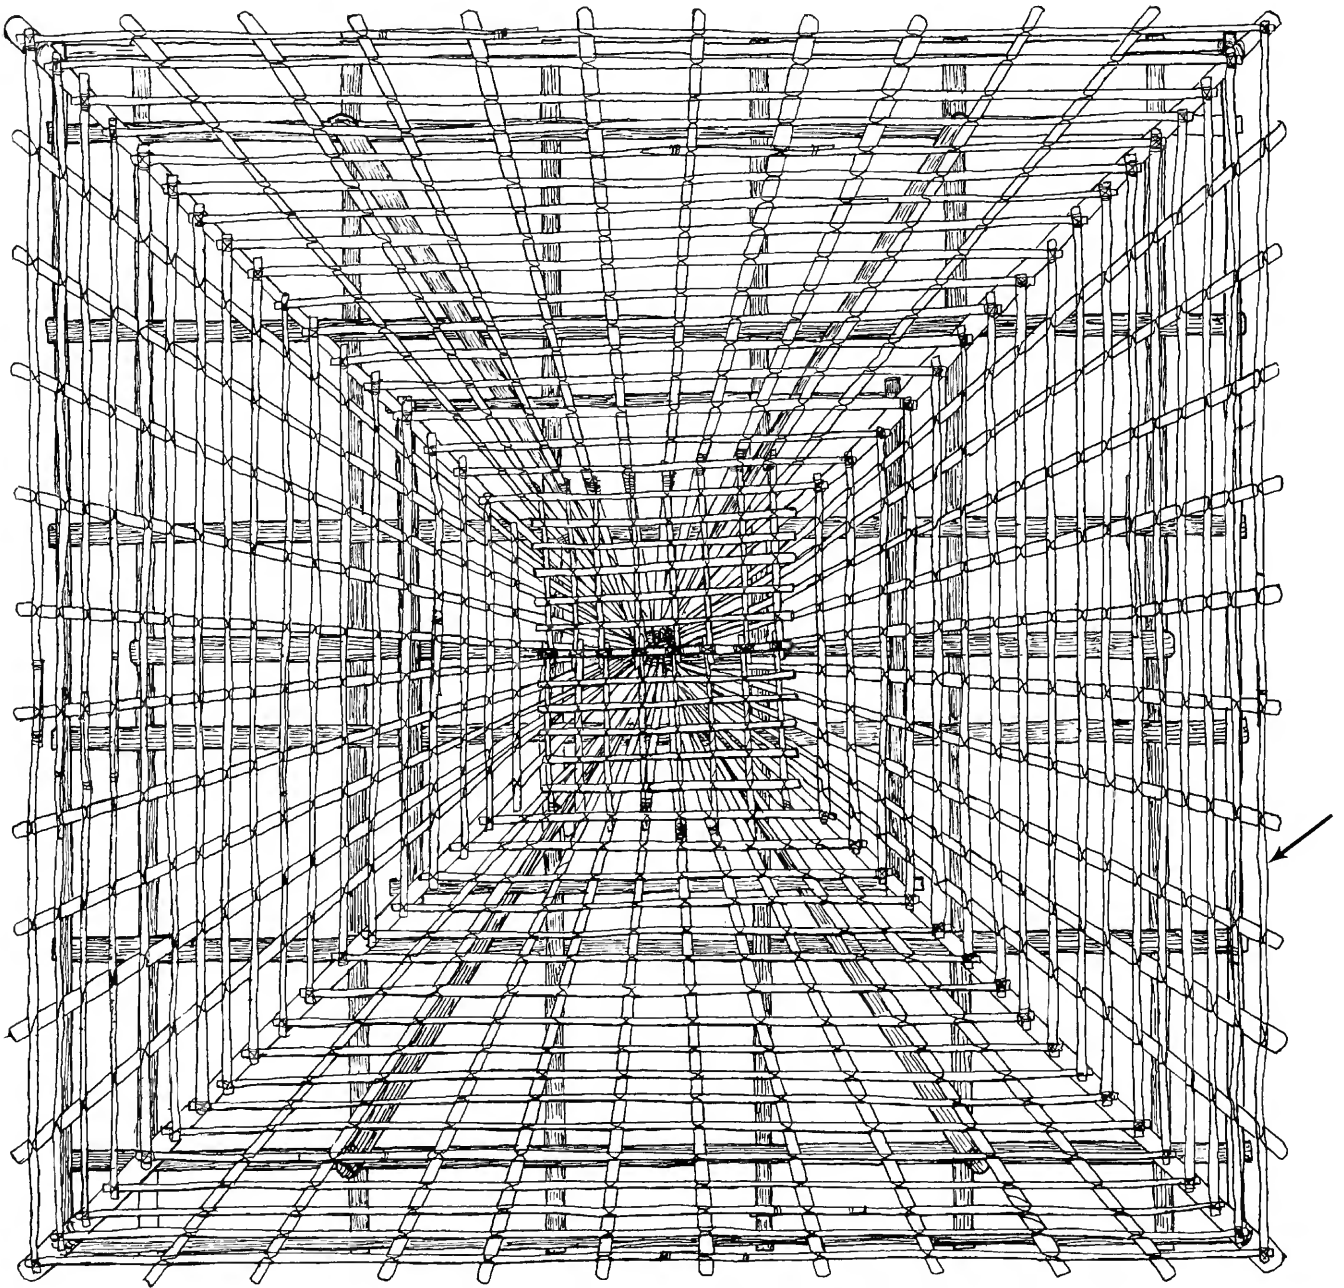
Roof plan with wattle in place: arrow points to wattle, xul.
